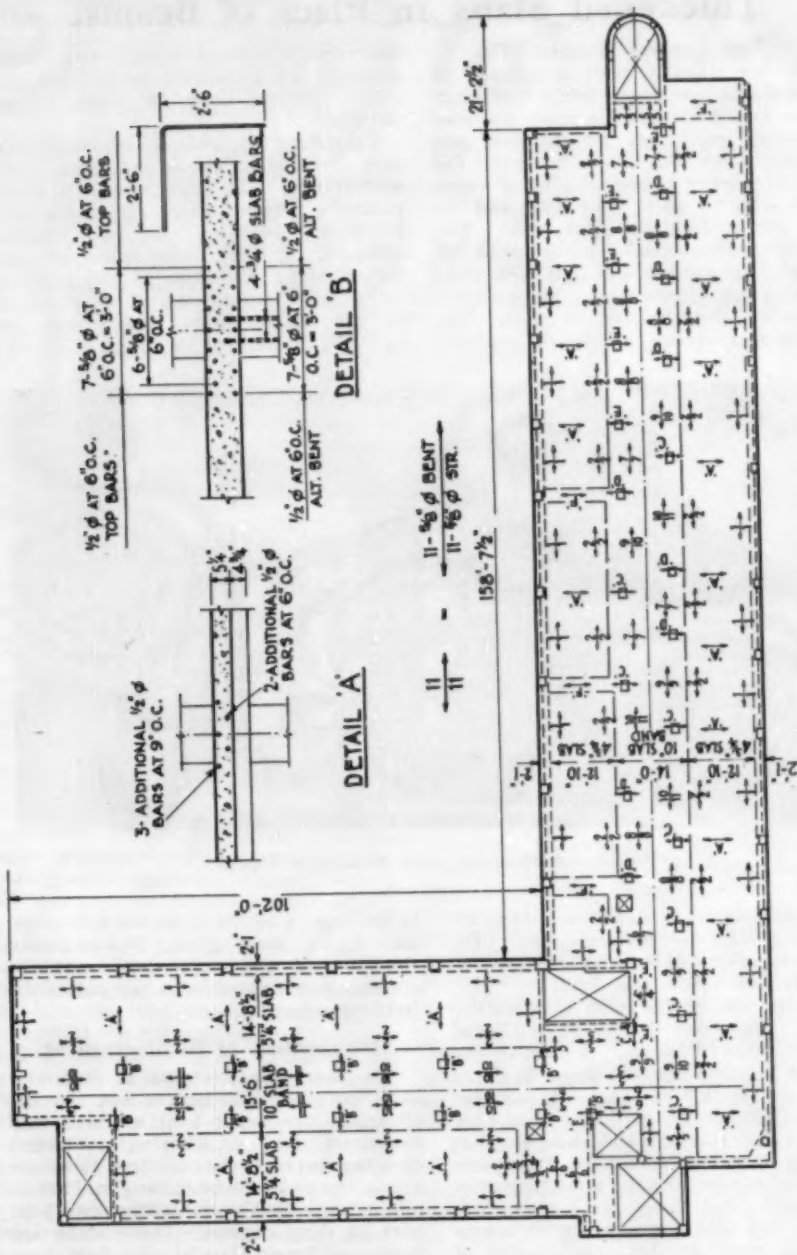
Plan of a Floor (The drawings do not show all the reinforcement).
